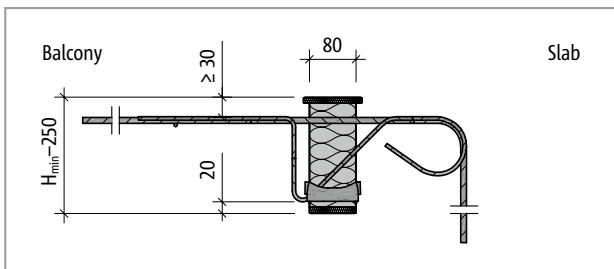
Schöck Isokorb® T type K-WU: Product section
